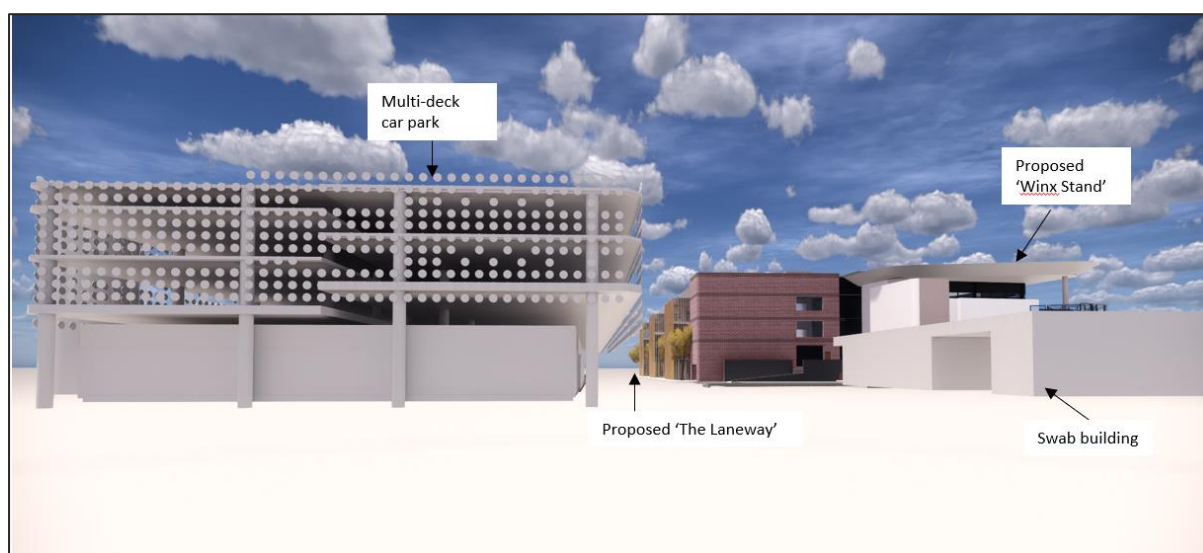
| Photomontage of 'The Laneway' looking east (Source: Applicant's RFFI)
